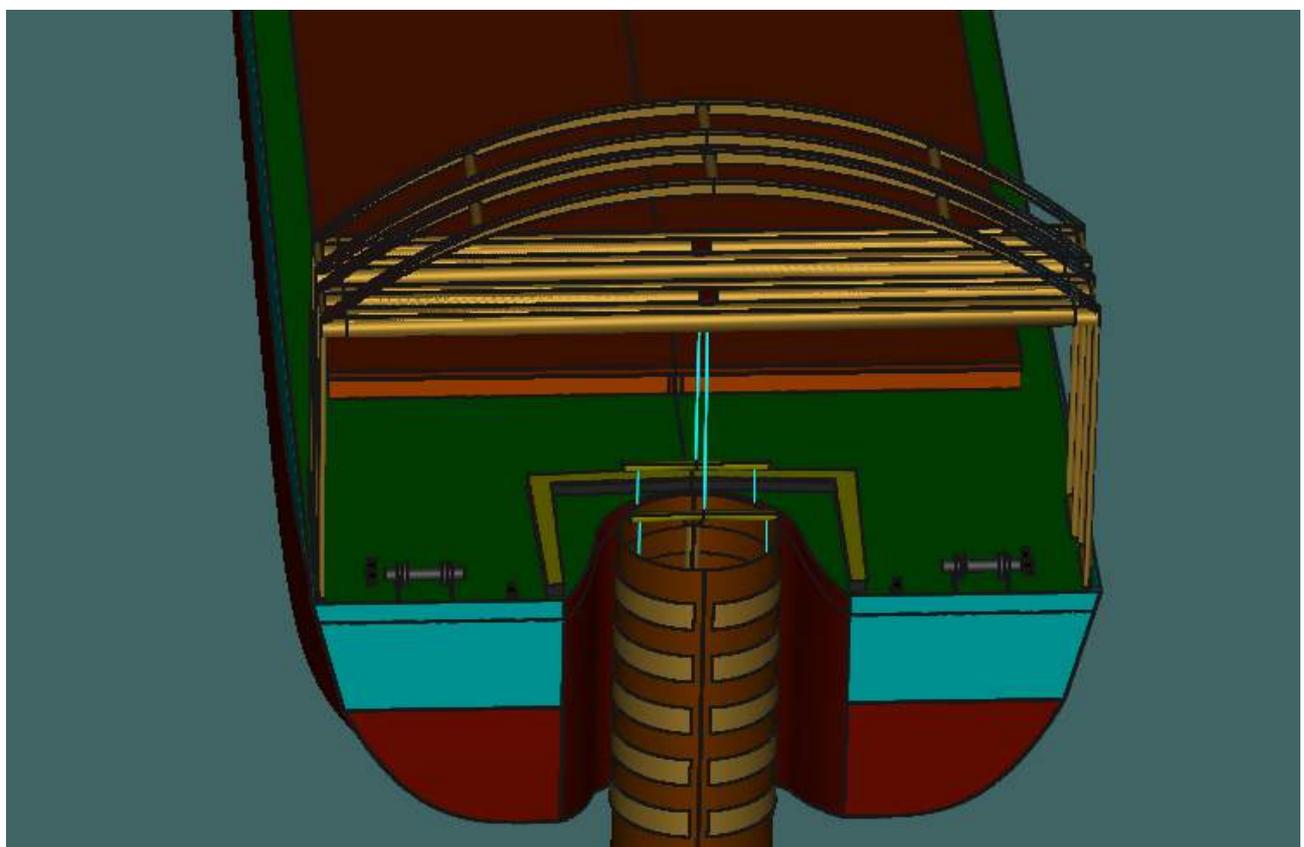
Plan of Tandem connection of Cranes to the monopile and Spreader bar
